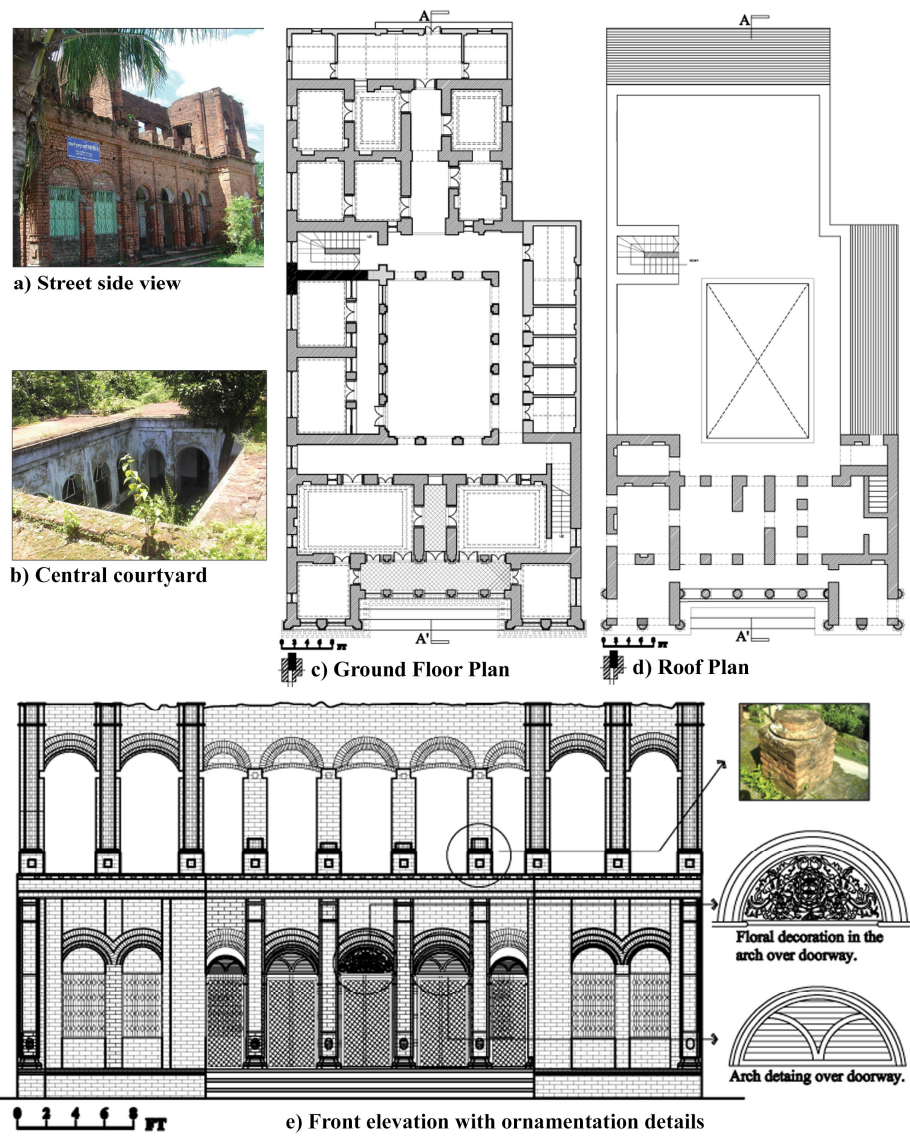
a) Street side view, b) Central Courtyard, c) Ground Floor Plan, d) Roof Plan, and e) Front Elevation with ornamentation details of the Building no. - 40.
